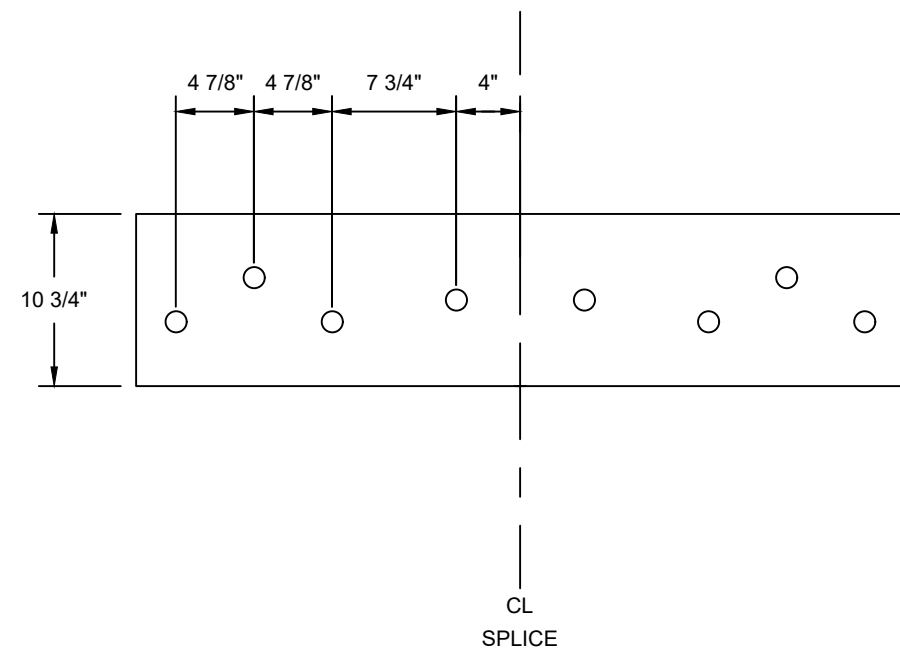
TYPICAL FRP BARRIER SECTION
